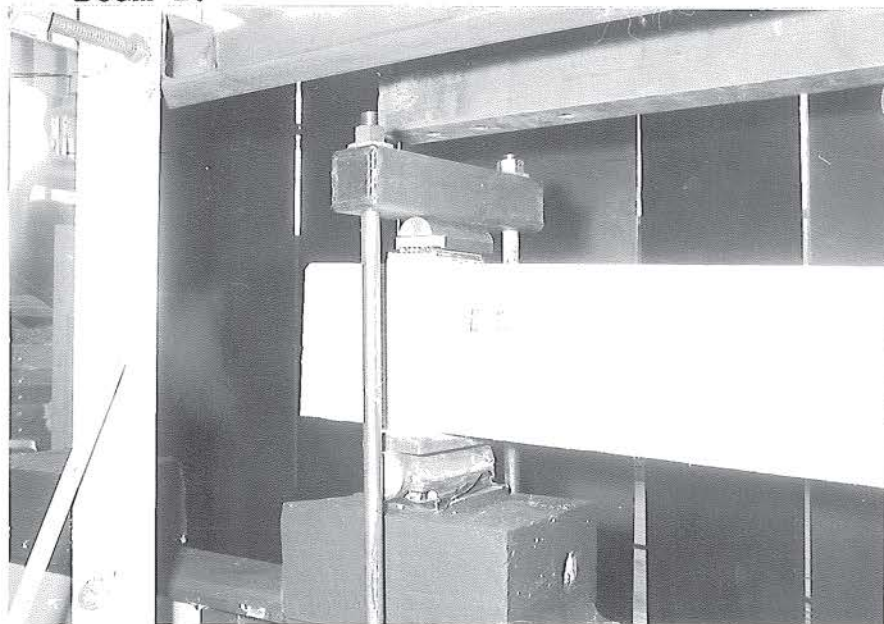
END SUPPORT FOR BEAM 2. The vertical tie bars and bearing plates and rollers were added for the test on Beam 2.
